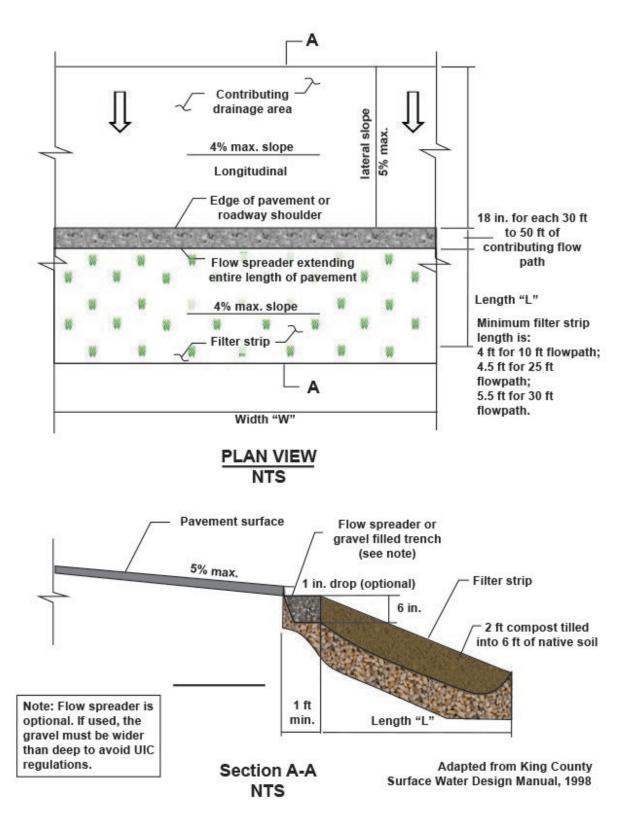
Plan and section view of a typical vegetated filter strip (adapted from King County 1998).
